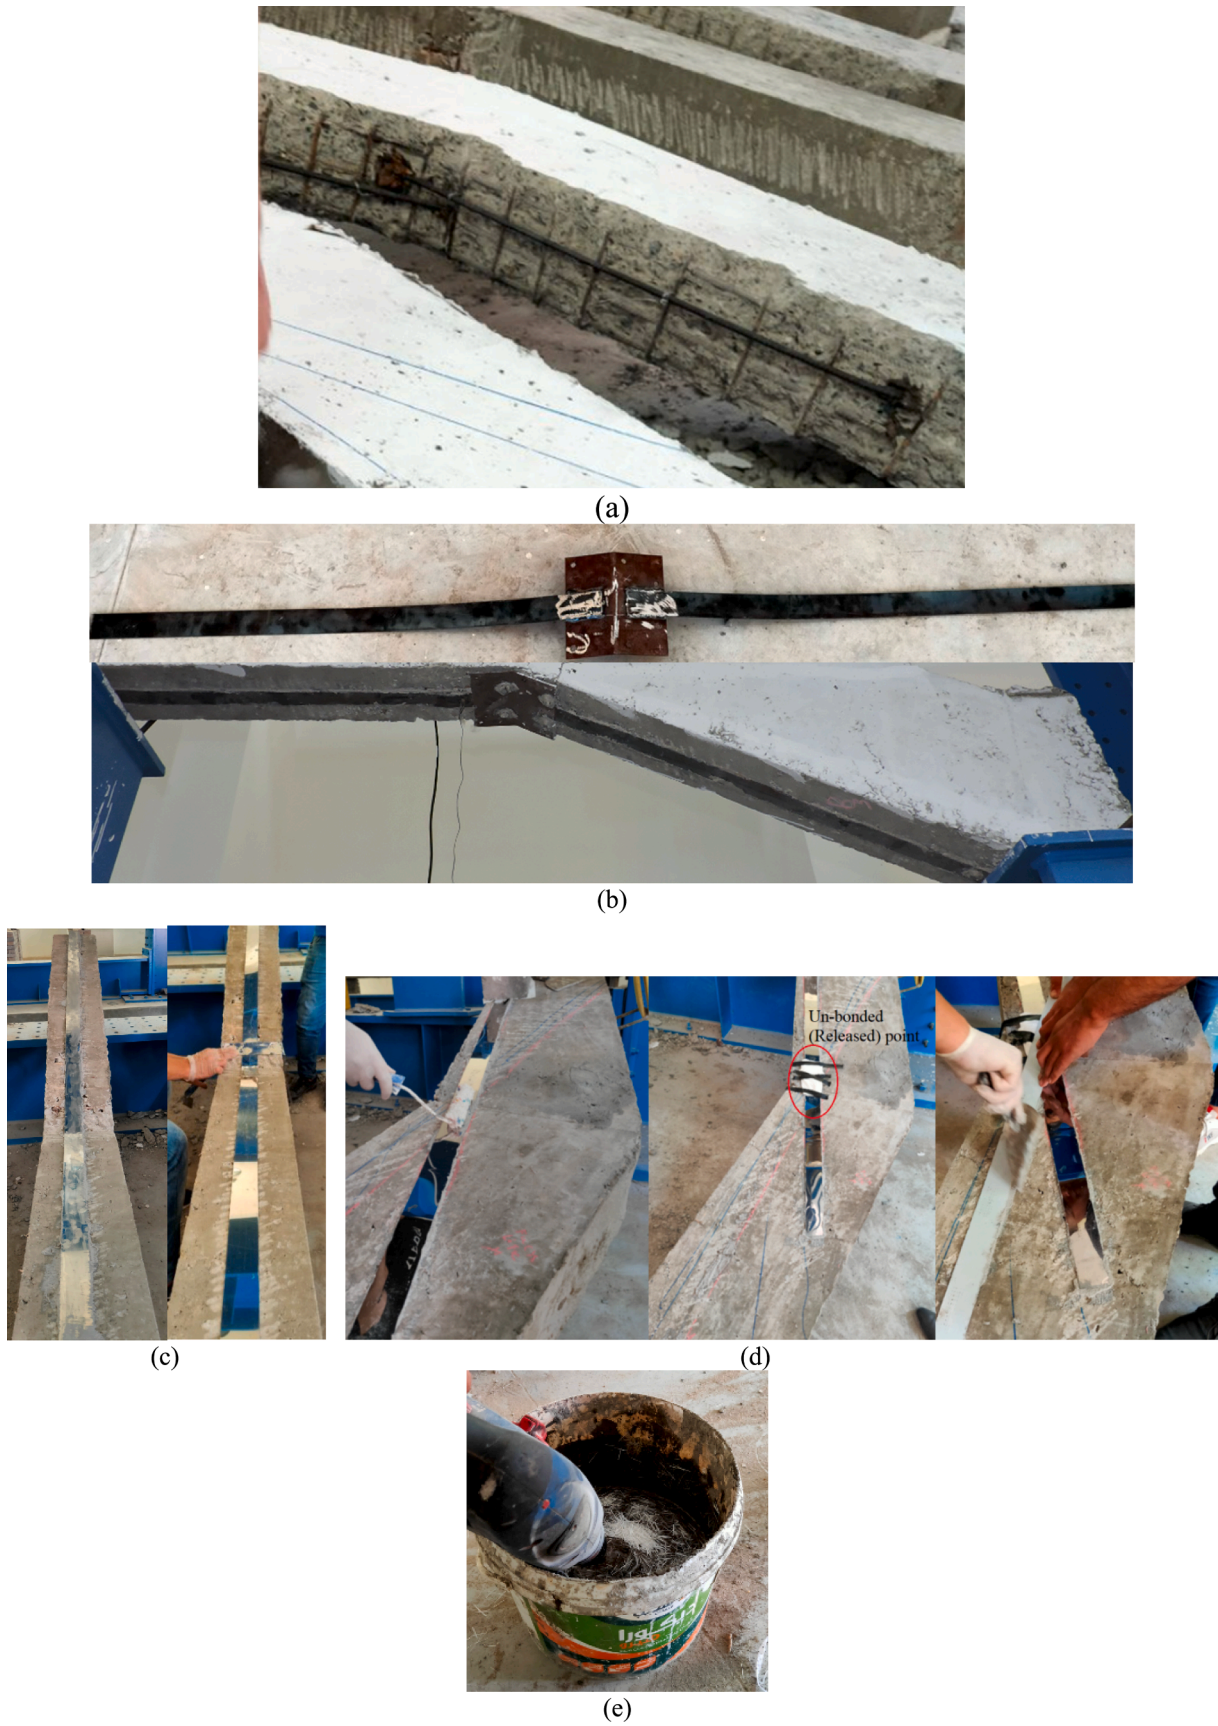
Strengthening preparation and adapting: (a) embedded steel bars in B1 and B2; (b) bonding of and adapting of steel sheets for B3; (c) bonding of SSPs used for B4; (d) bonding of SSPs used for B5; (e) ECC mechanical mixing used as concrete re-covering for B1.
